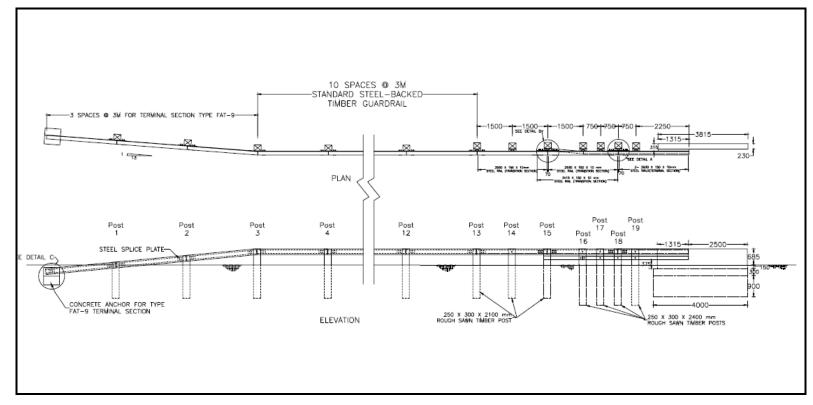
Layout of Type B Steel-Backed Timber Guardrail
